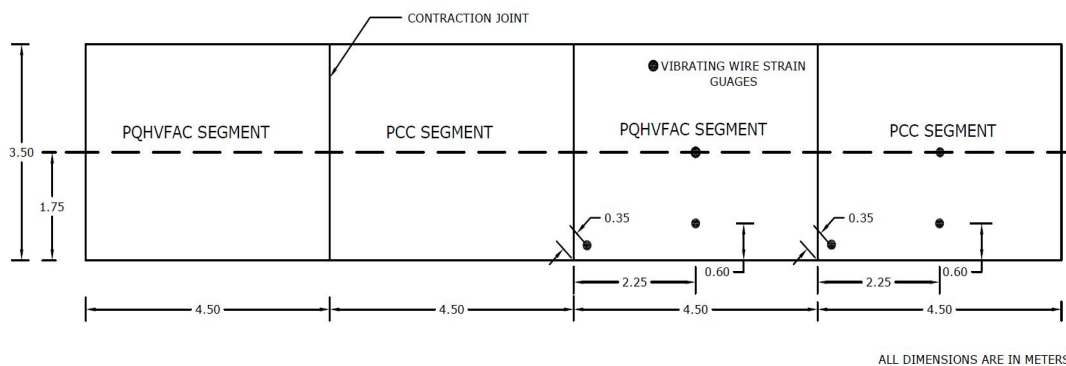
LAY OUT OF VIBRATING WIRE STRAIN GAGES IN PAVEMENT TEST STRETCH
